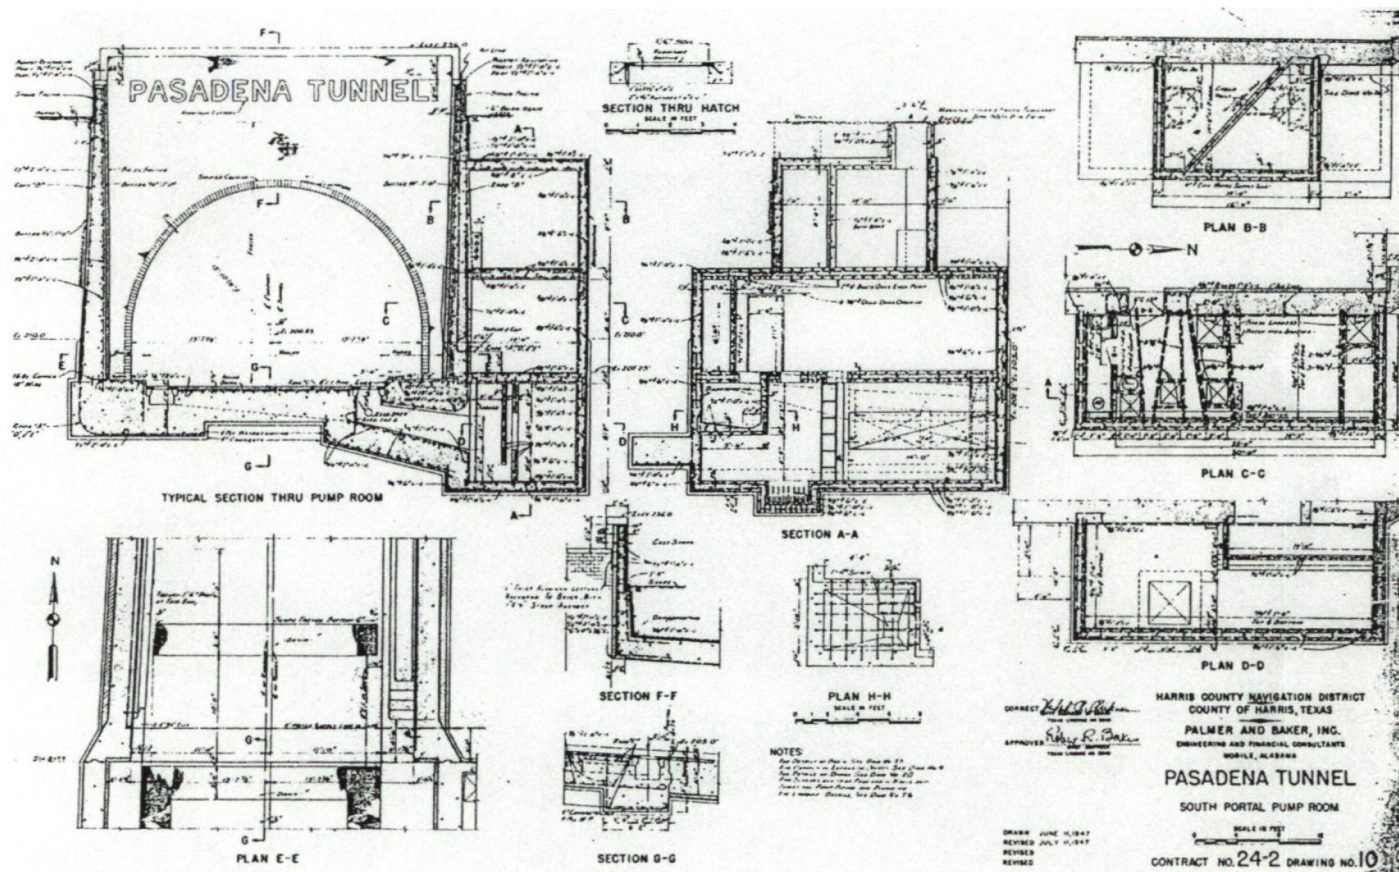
Washburn Tunnel, typical section through pump room. From Palmer and Baker, Inc., revised construction set, July 1947.
